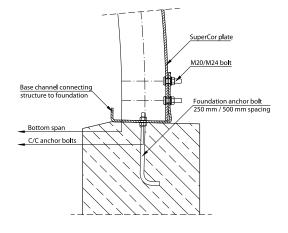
Connection of SuperCor[®] structure with concrete footing
